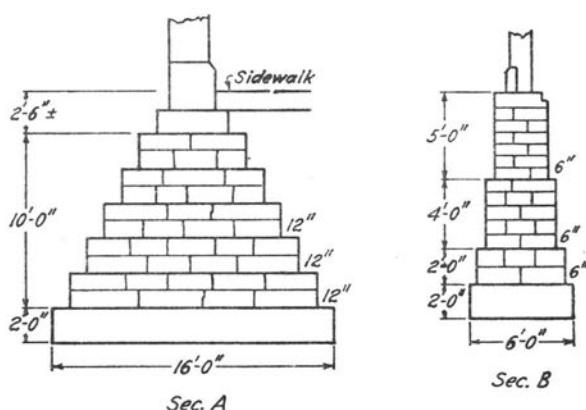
SECTIONS THROUGH FOUNDATIONS OF
